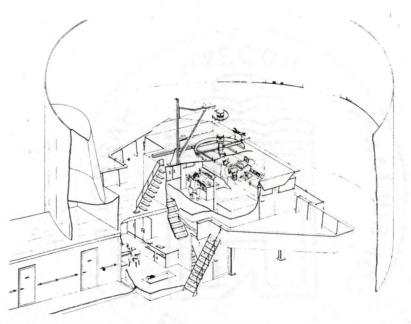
Sectional perspective drawing of the manoeuvring simulator.
